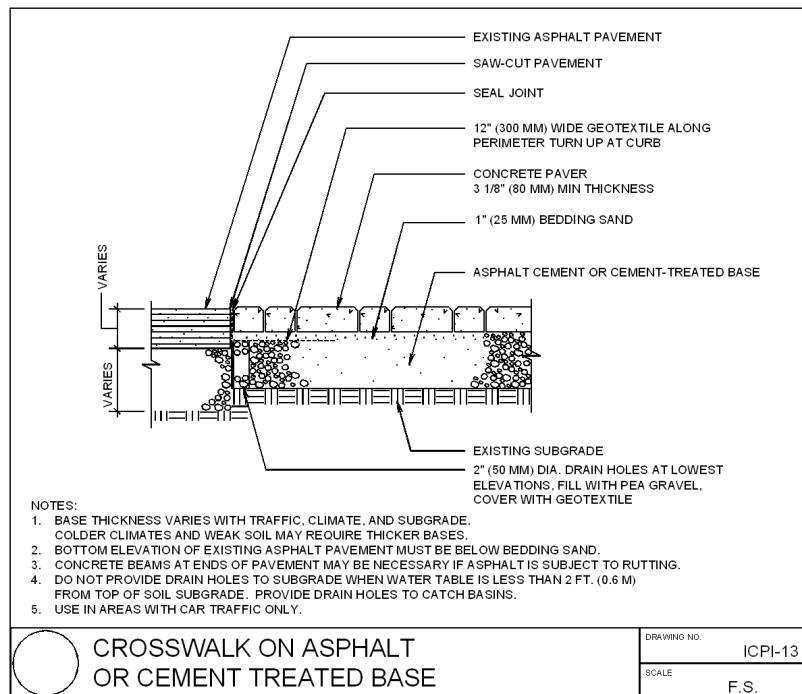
Typical Interlocking Concrete Block Design Detail for a Crosswalk. [ICPI, 2003]
